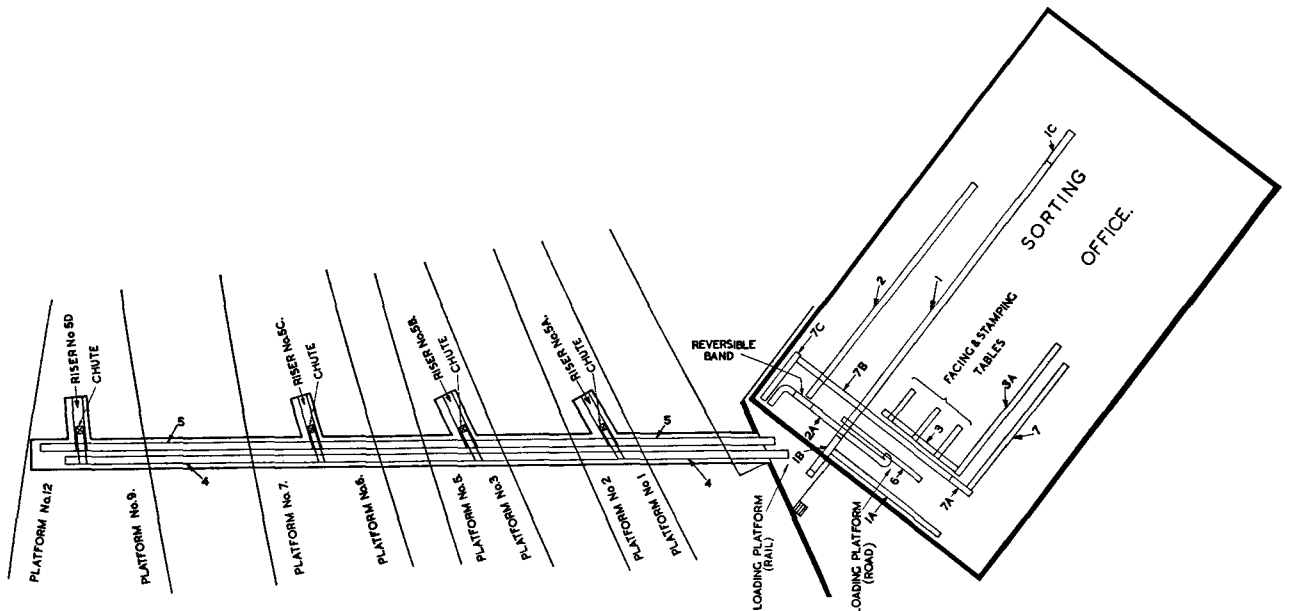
LAYOUT OF SORTING OFFICE AND RAILWAY STATION CONVEYORS.
